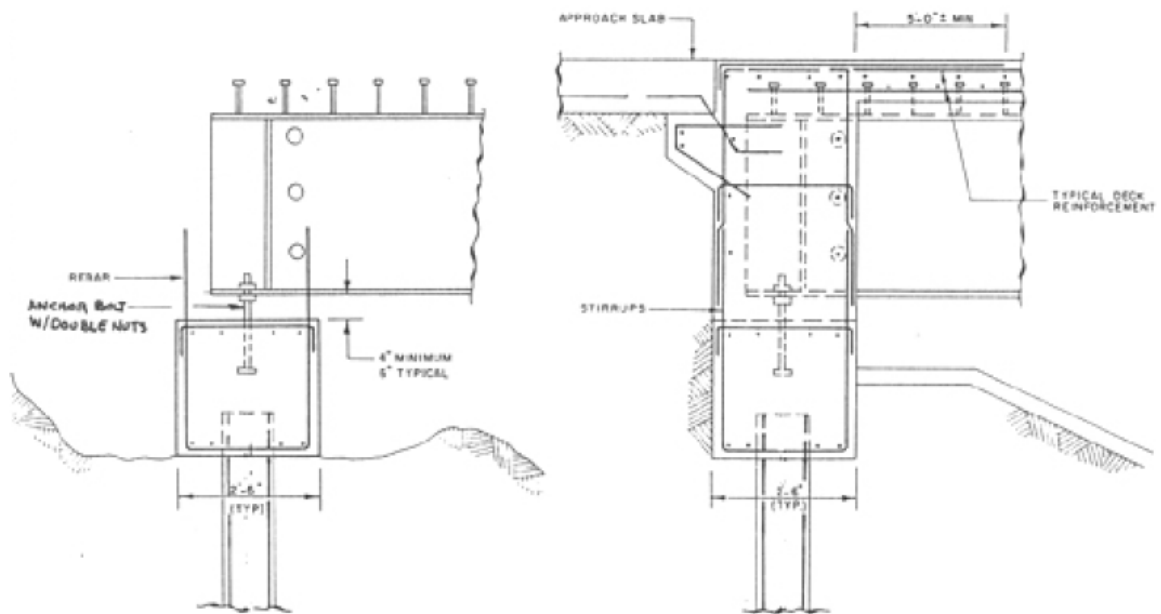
Integral abutment detail with projecting anchor bolts connecting the pile cap and girder (Wasserman and Walker 1996)
